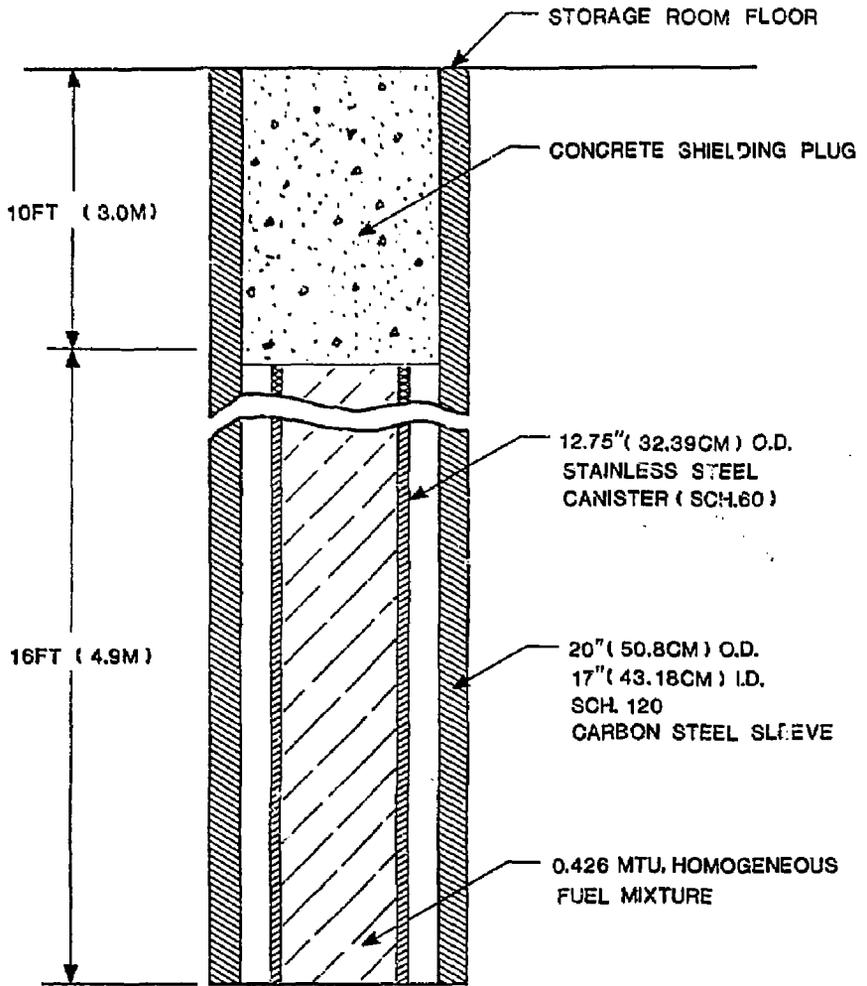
EMPLACEMENT PACKAGE DETAILS.
